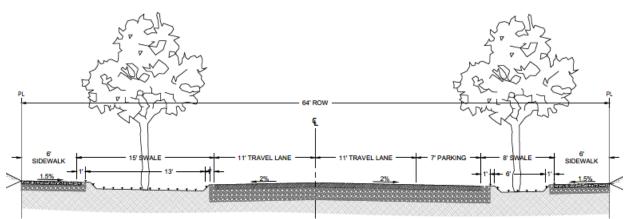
Local Street Section, Parking on East Side Only. Source: Ashley & Vance Engineering.
